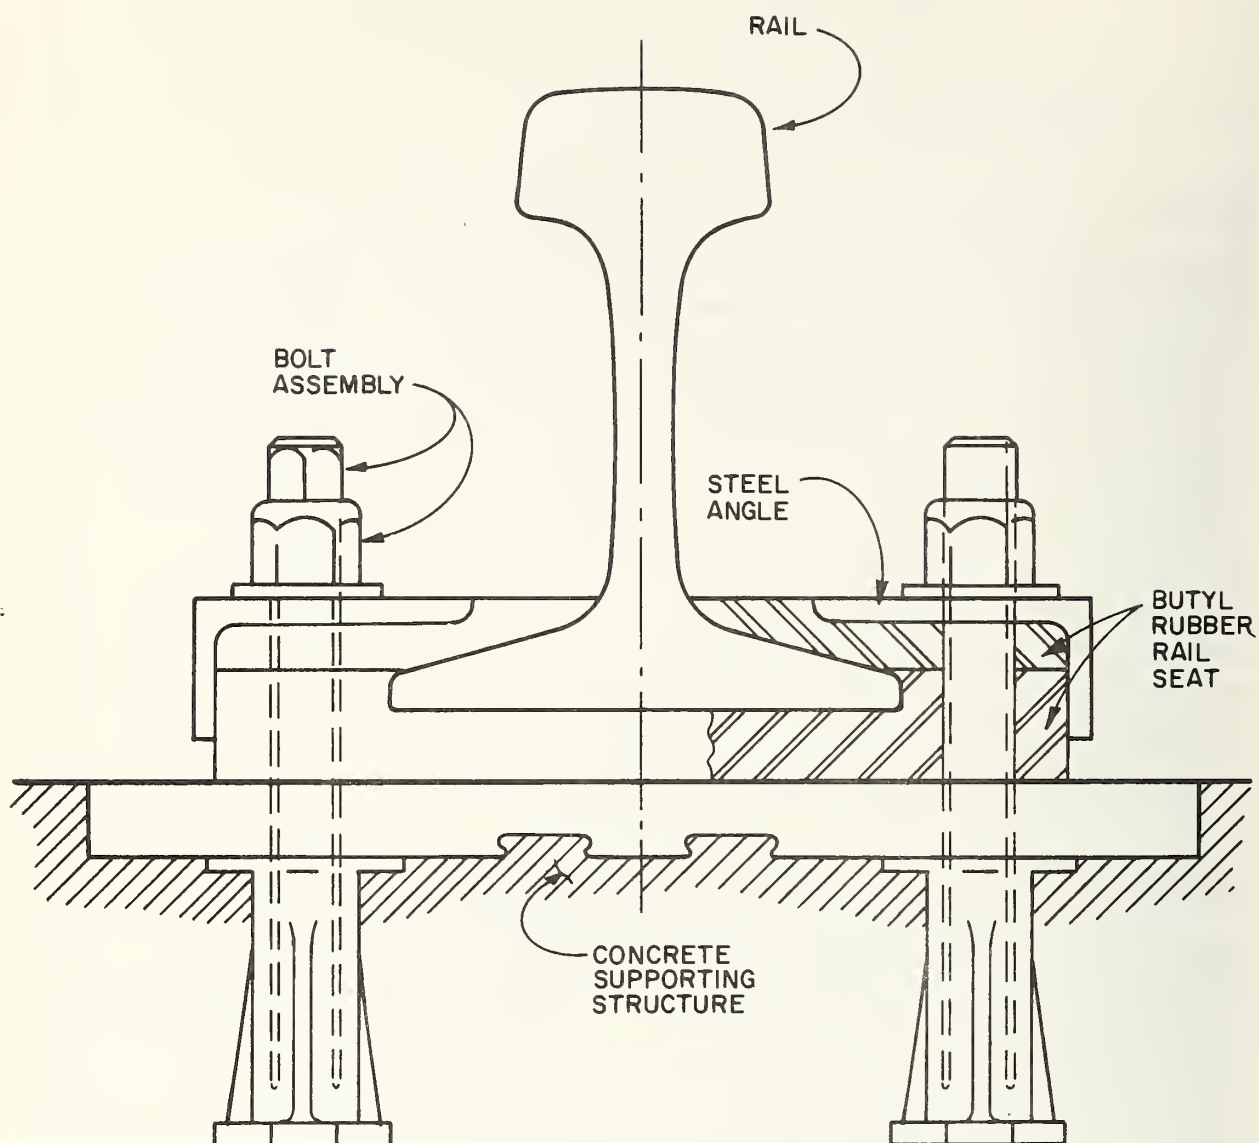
TYPICAL RAIL FASTENER CONFIGURATION
